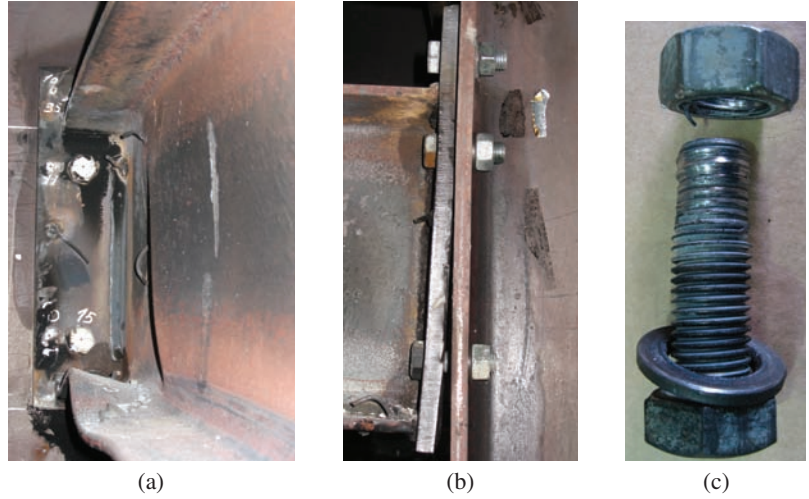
(a) Local buckling on the beam bottom flange and web; (b) deformation at the bottom of the end plate; (c) nut and bolt stripping—bottom bolt row at test EJ01.
